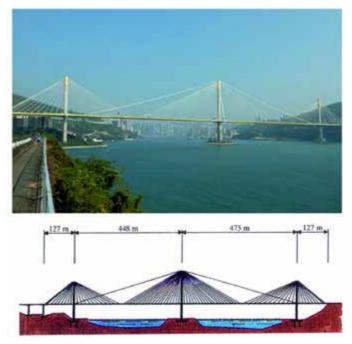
Ting Kau Bridge, Hong Kong, SBP Stuttgart, 1998 [5], (sbp.de)
